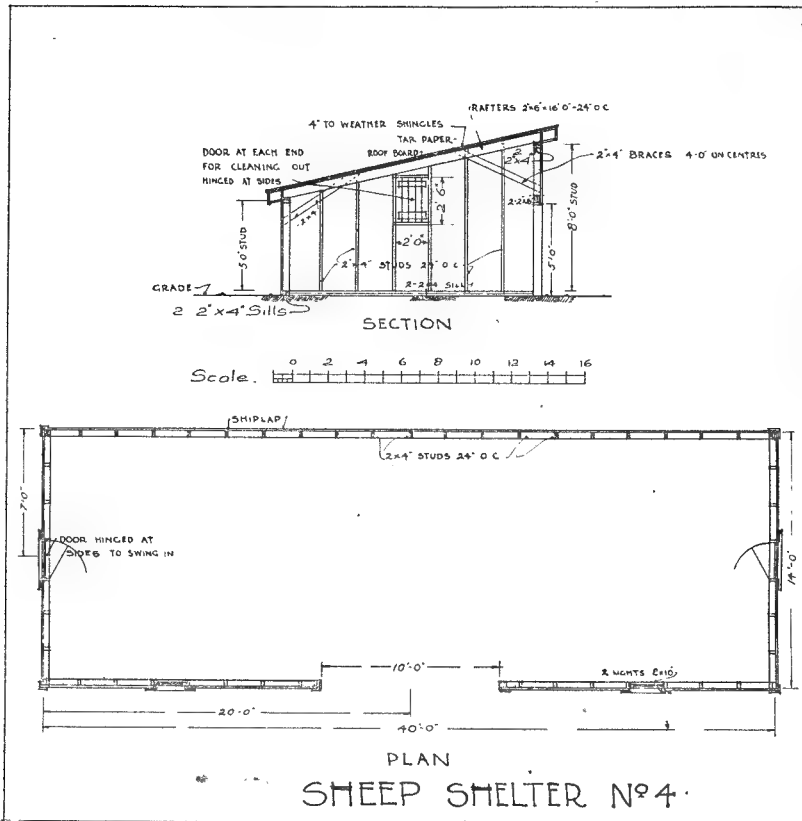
The building is 14 x 40 feet and would accommodate over fifty sheep. They are fed outside in racks or on the ground.
